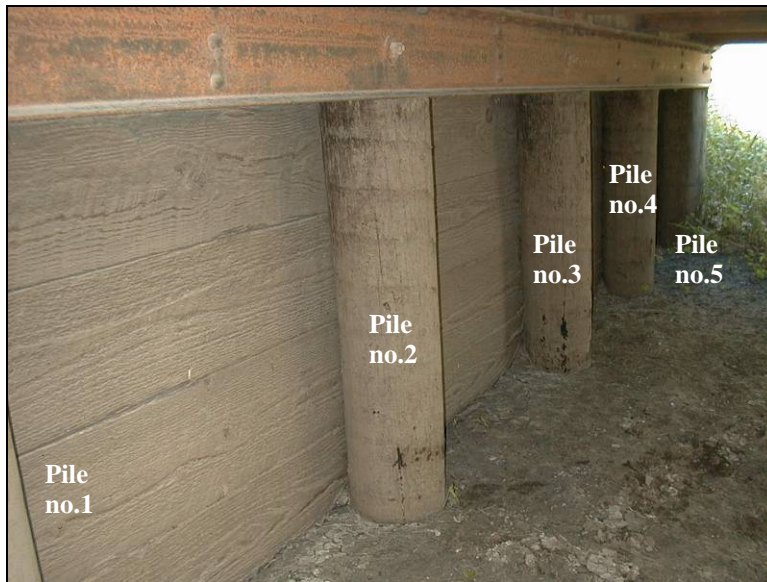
Southeast abutment at a higher elevation than the water level (Bridge No. 237380 Mahaska County – April 16 2006)
